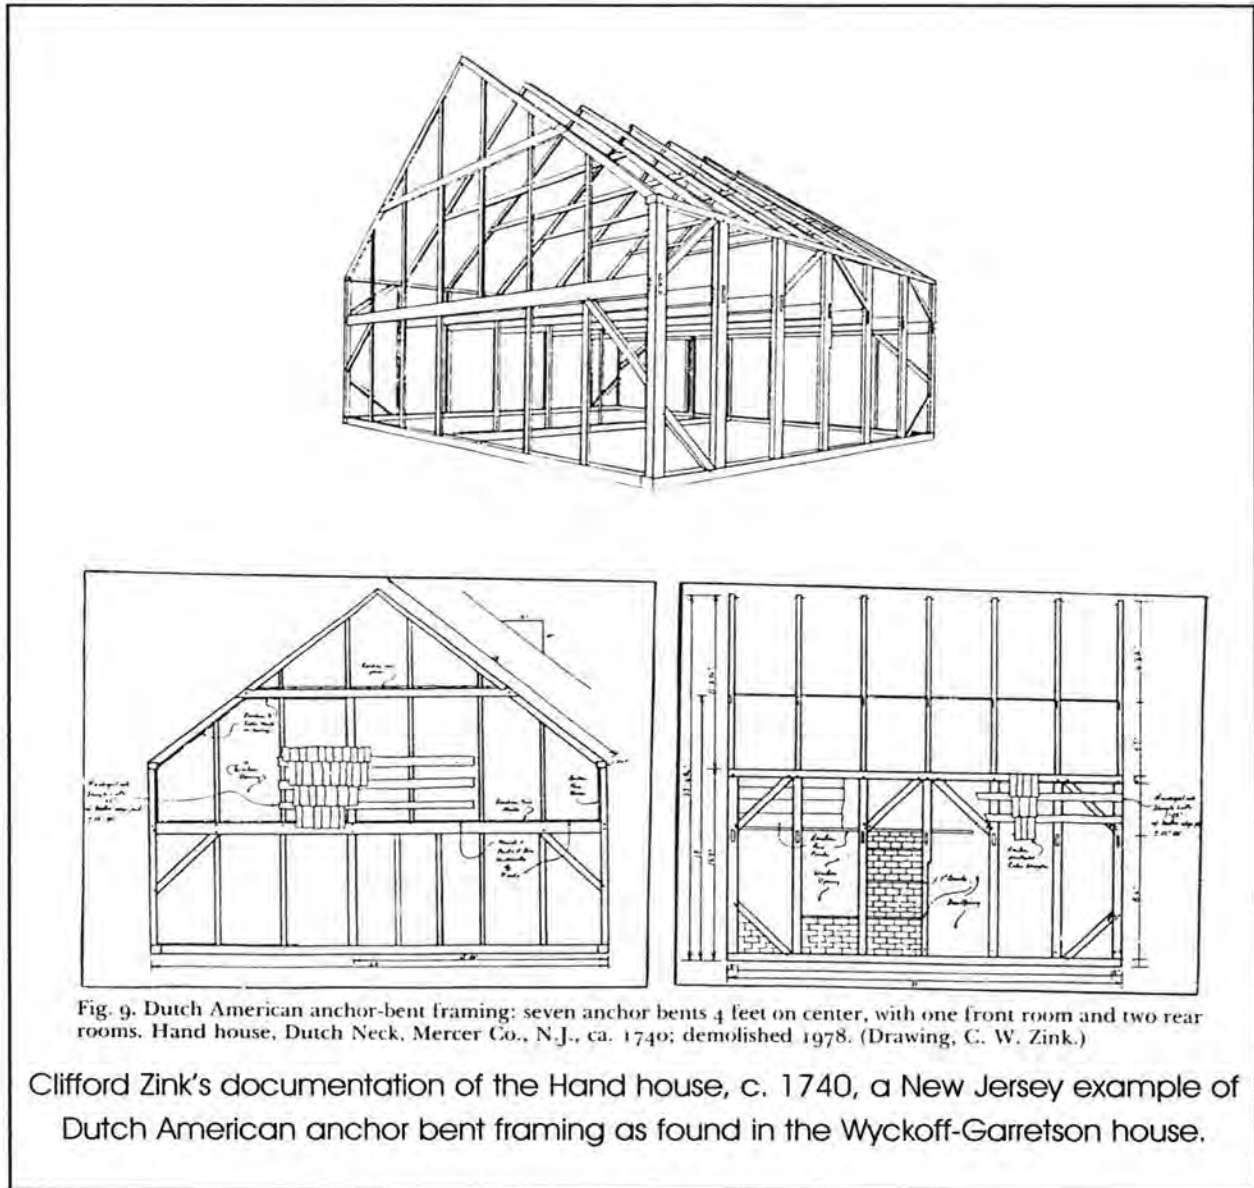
Dutch American anchor-bent framing: seven anchor bents 4 feet on center, with one front room and two rear rooms. Hand house, Dutch Neck, Mercer Co., N.J., ca. 1740; demolished 1978. (Drawing, C. W. Zink.)
